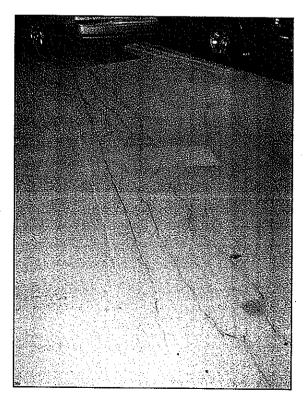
Negative bending moment cracking of concrete slab
